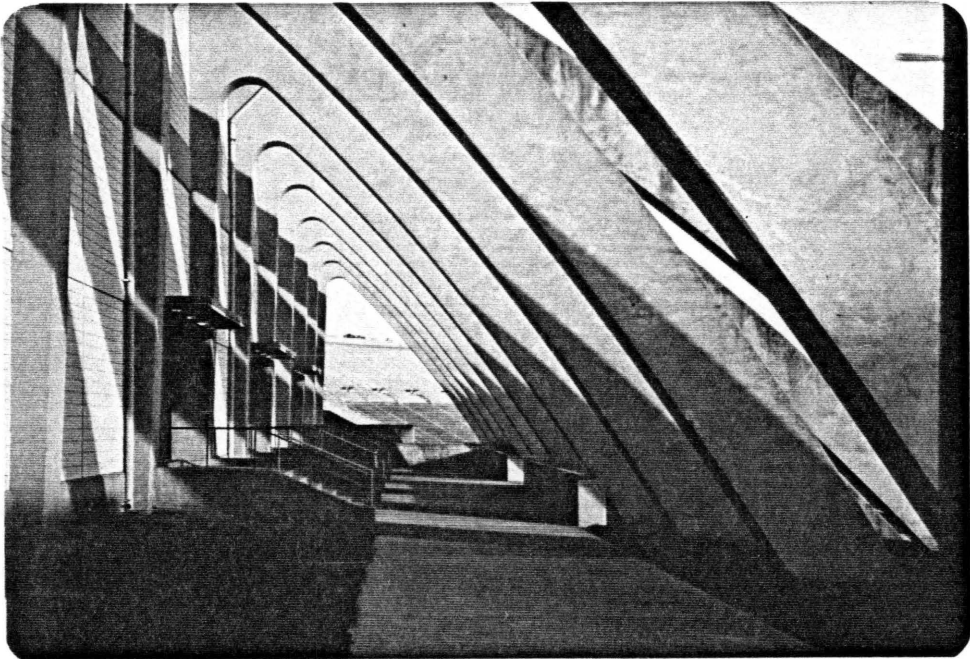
Blacksburg VA.: Coliseum. Reinforced concrete buttresses absorb thrust from wooden laminated arches.
